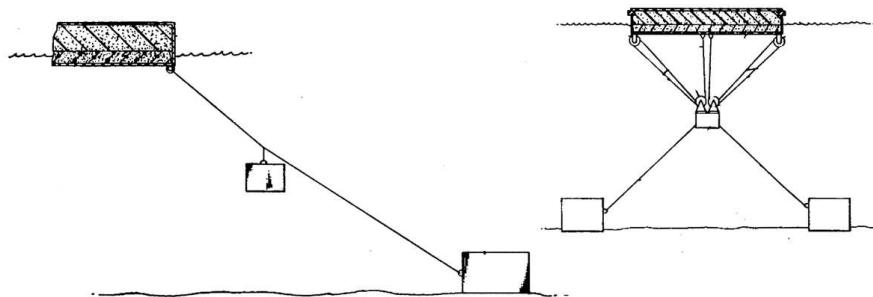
Typical cable systems used to anchor the floating breakwaters to the seabed
